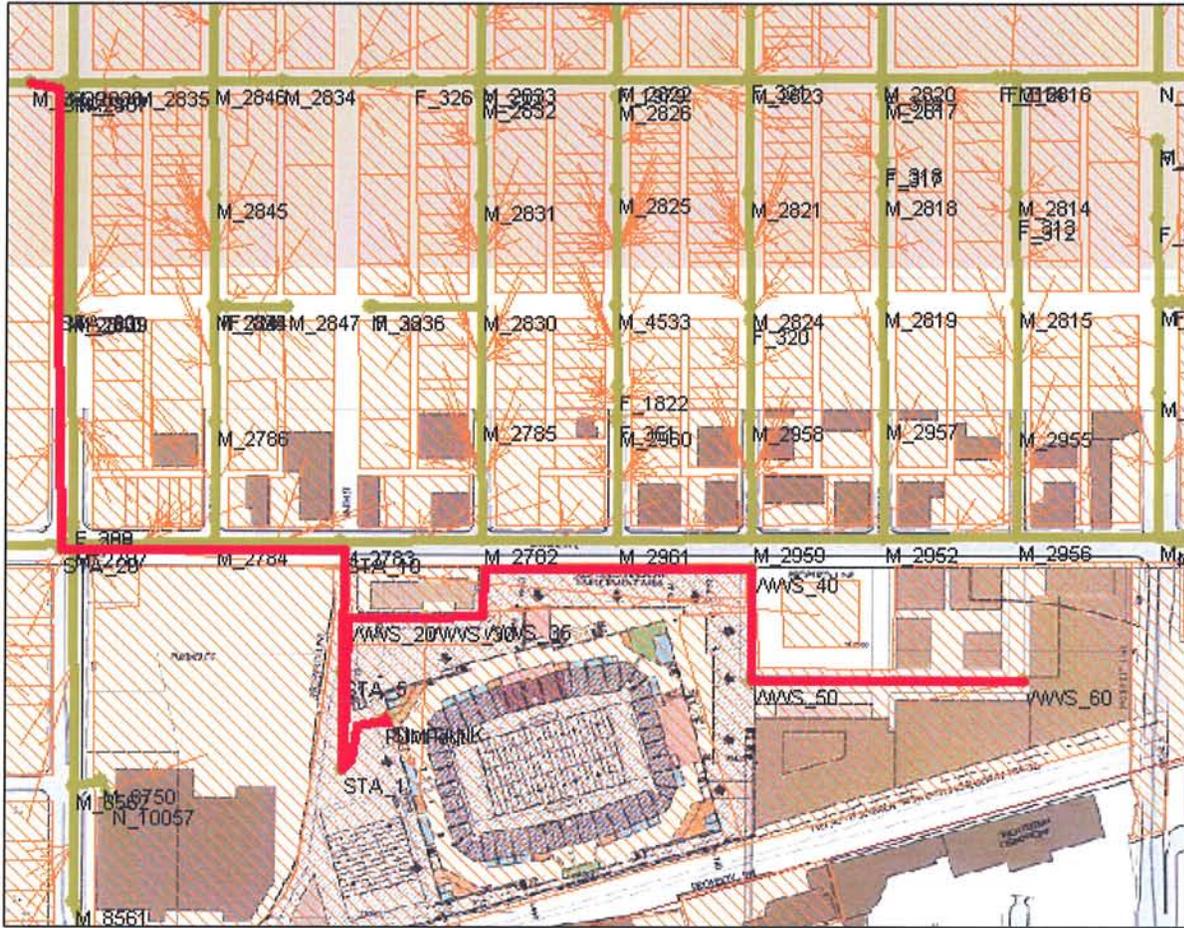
Alternative 2: 200 mm Internal Wastewater Sewers and 600 mm Discharge Main
